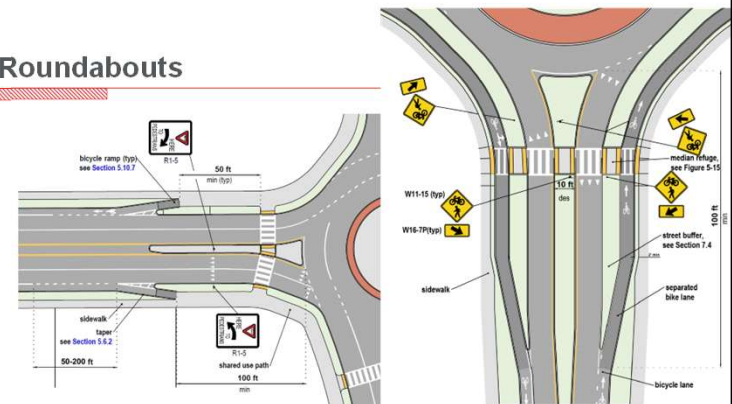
Typical Layout of Bike Lane Transitions to Shared Use Path at Multilane Roundabout with Bike Ramps
